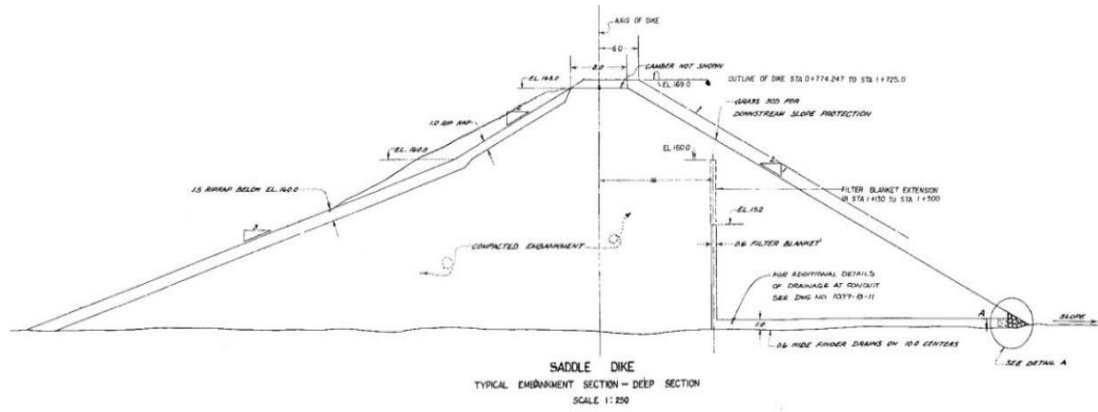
Typical as-built section of a saddle dam (Royal Irrigation Department 1975).
